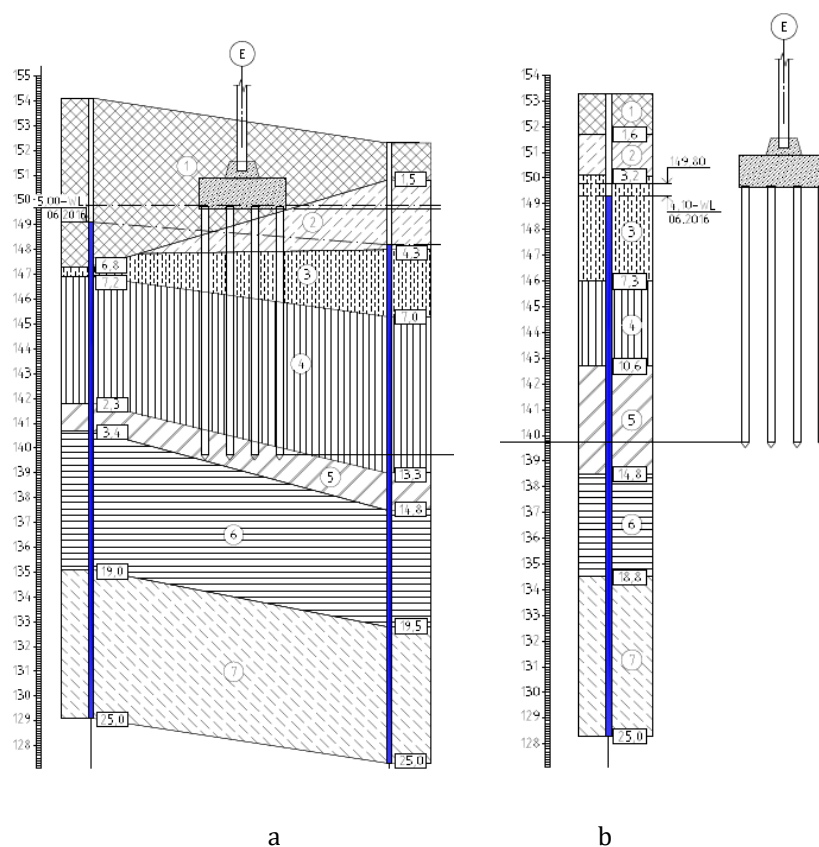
Referencing of pile foundations to soil profile: a - pile No. 1; b - pile No. 2.
